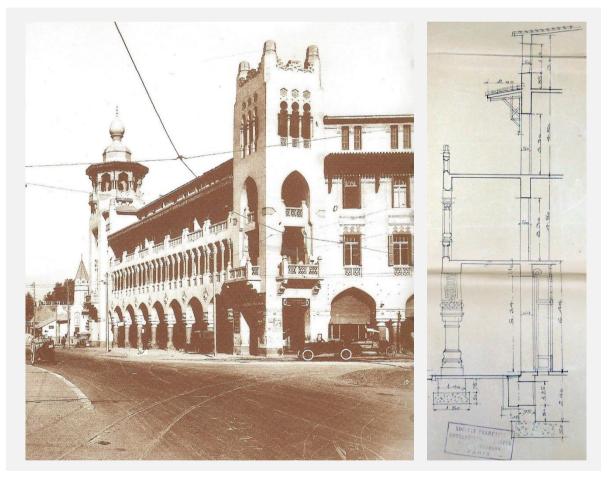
Right picture showing the shaded arcades at Building 57. Left picture shows the wall section at the same building from HOC archives.
